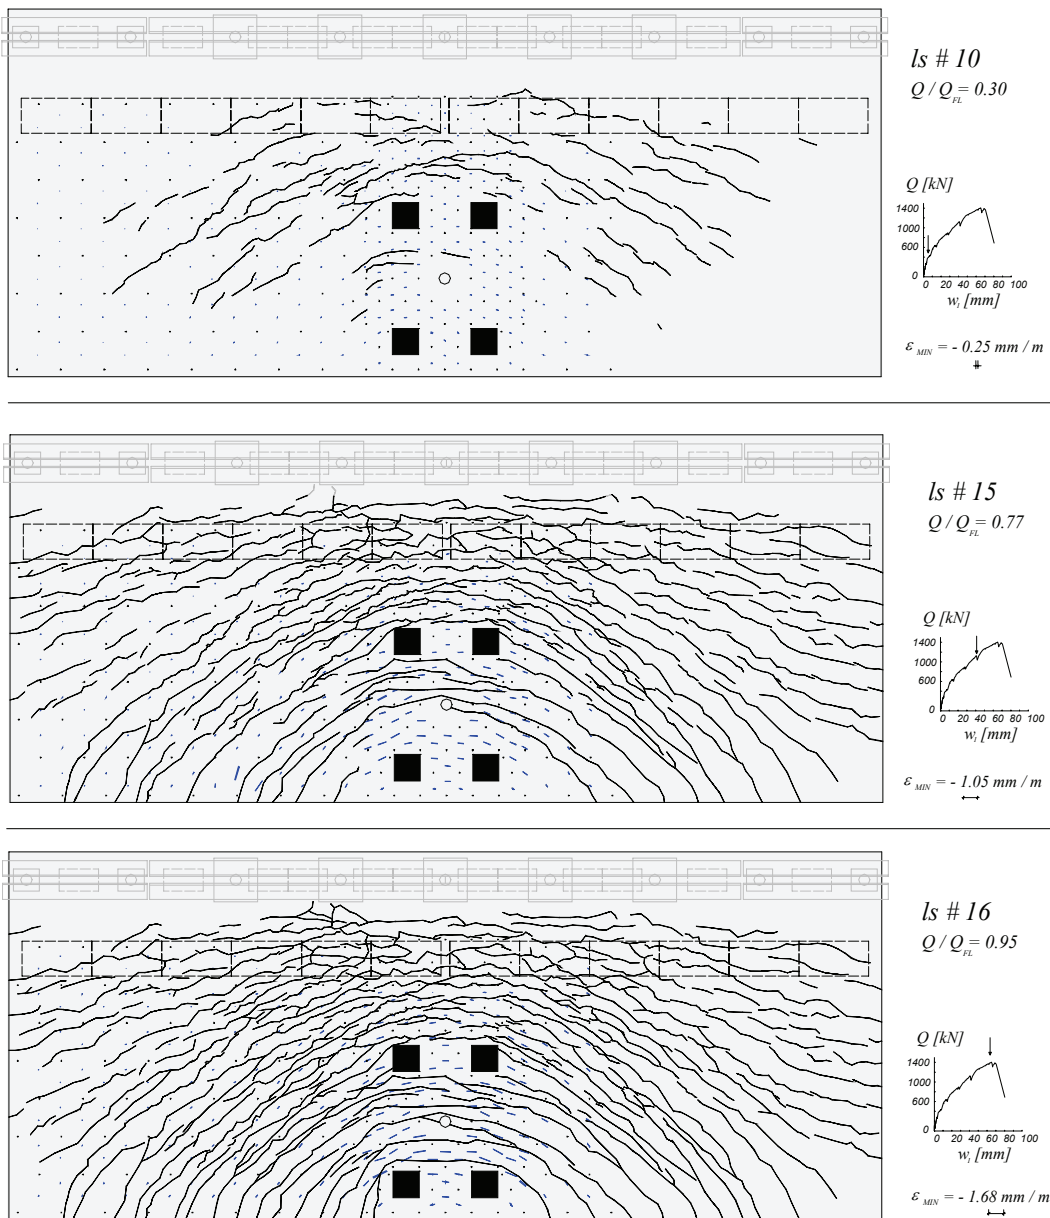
Test DR1-a: Crack pattern and compressive principal strains on the top surface
